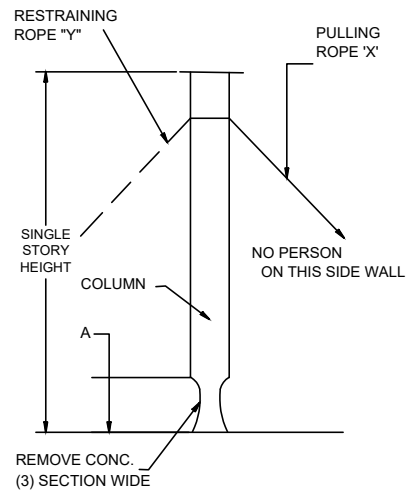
MANUAL DEMOLITION OF IN-SITU CONCRETE STRUCTURE
